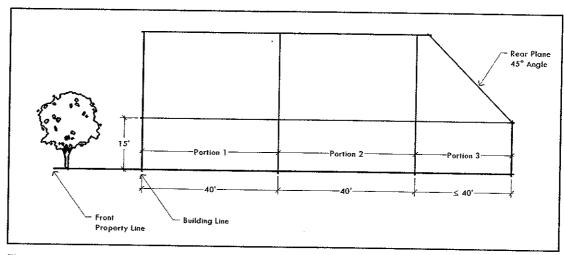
(Elevation View) Rear Setback Plane (Level Ground)
